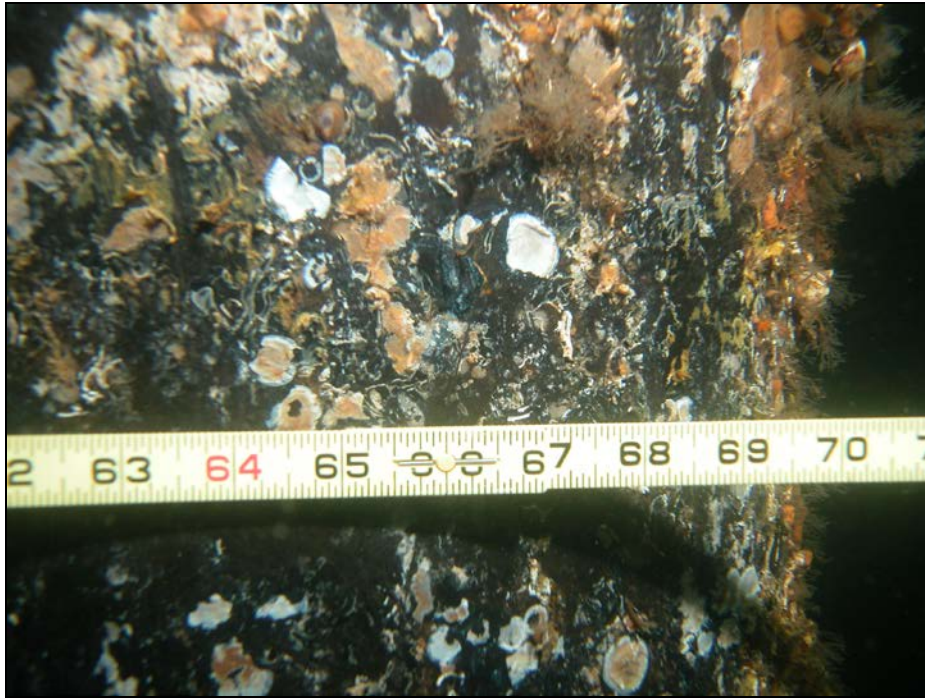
Typical view of the deterioration of timber piles throughout the structure, often caused by marine borers.
